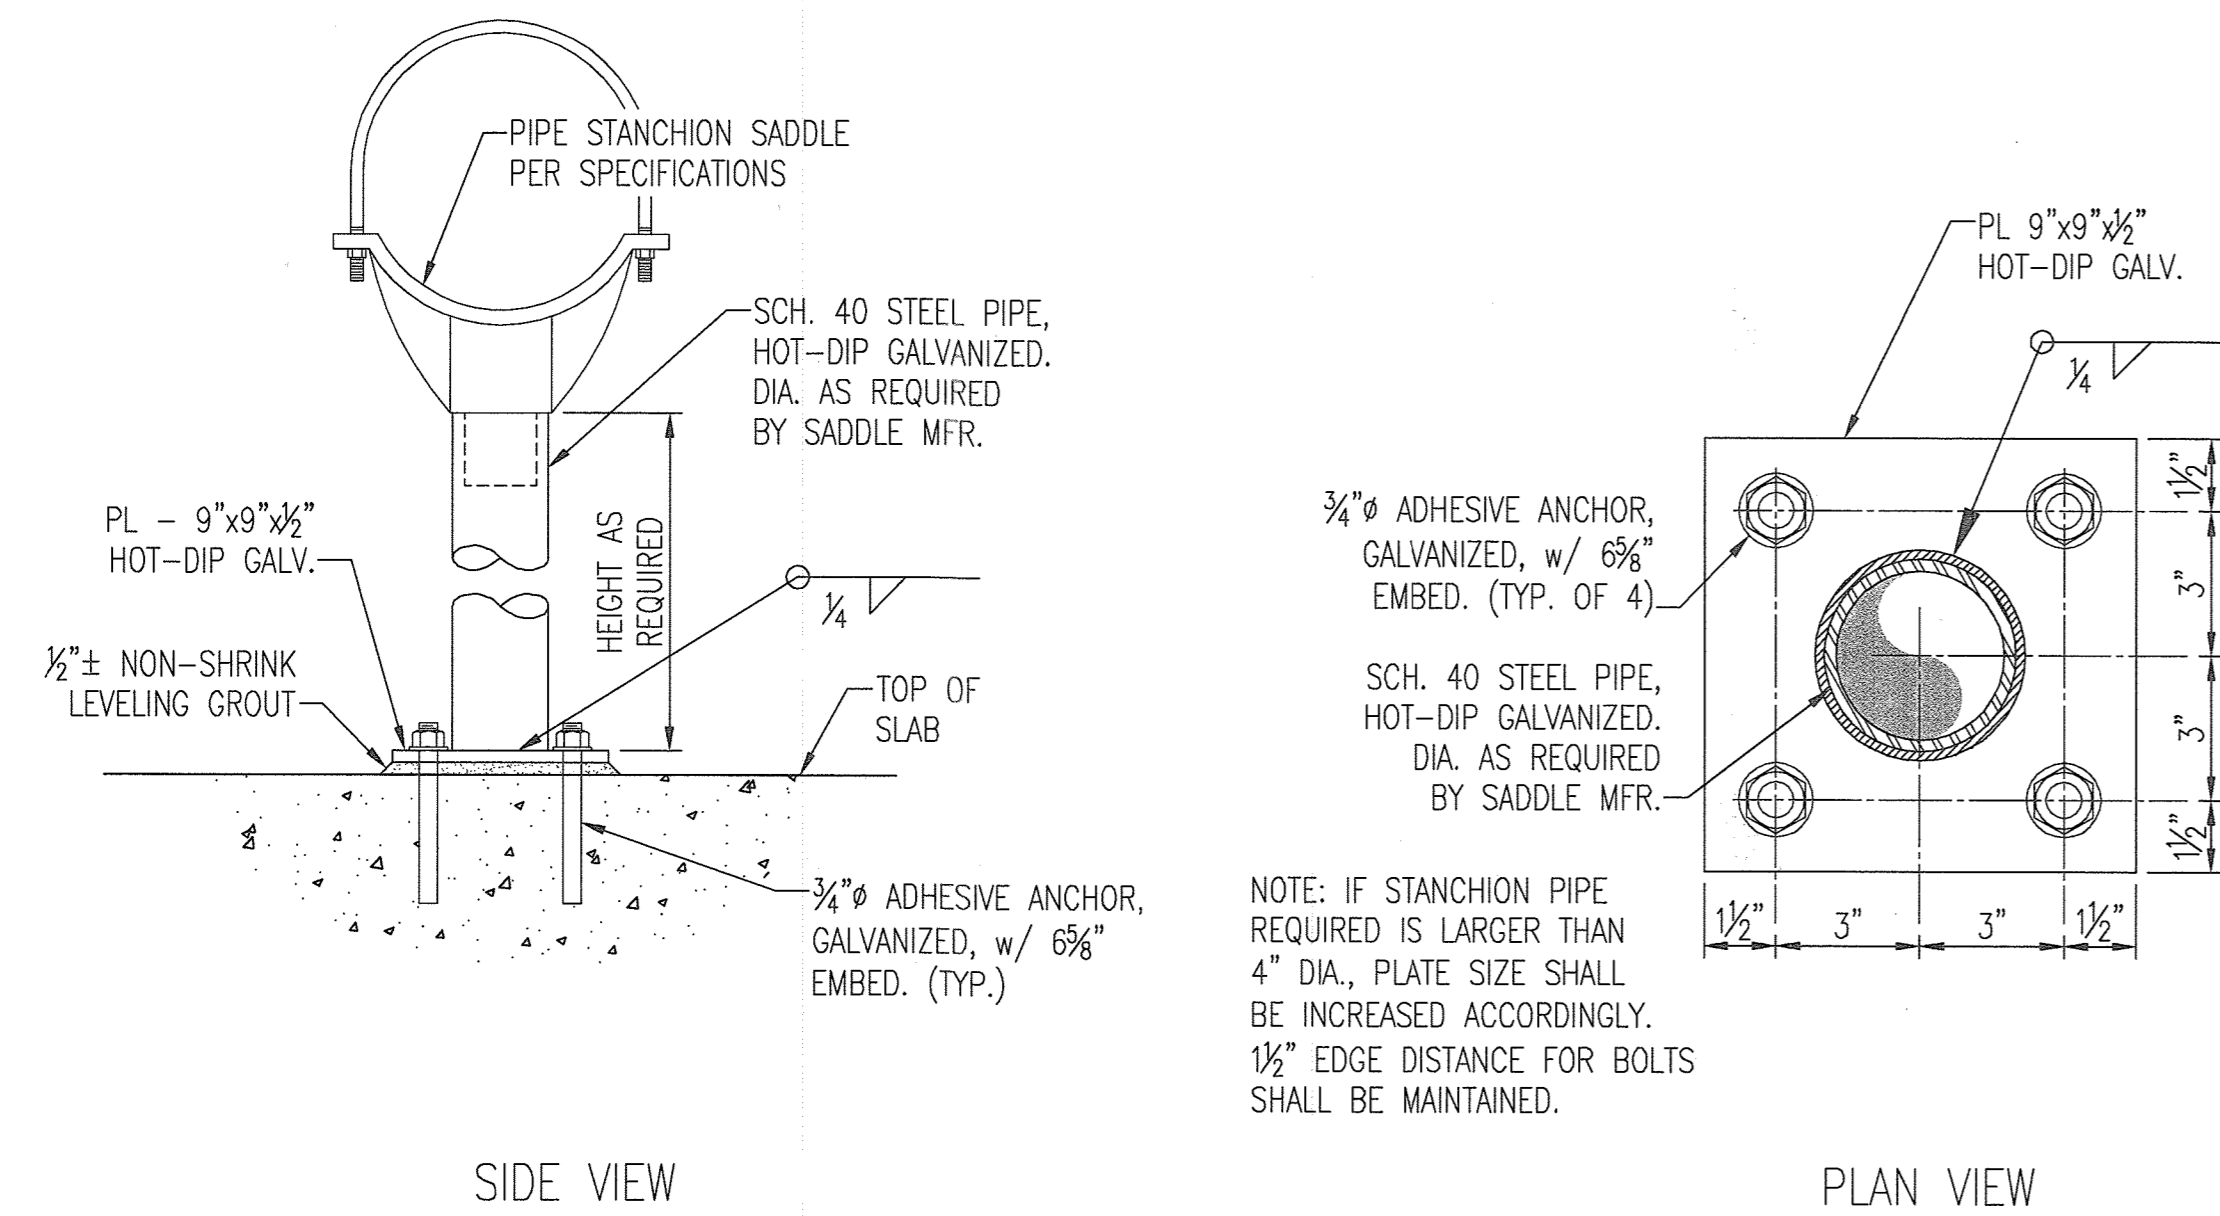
DETAIL: TYPICAL CONCRETE PIPE OR FITTING SUPPORT SADDLE
